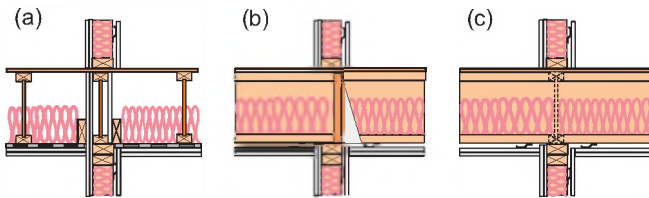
Construction details of the 3 wall/floor systems. Joists were oriented (a) parallel to the wall, (b) perpendicular to the wall, and (c) with joists continuous across the wall, perpendicular to it.
